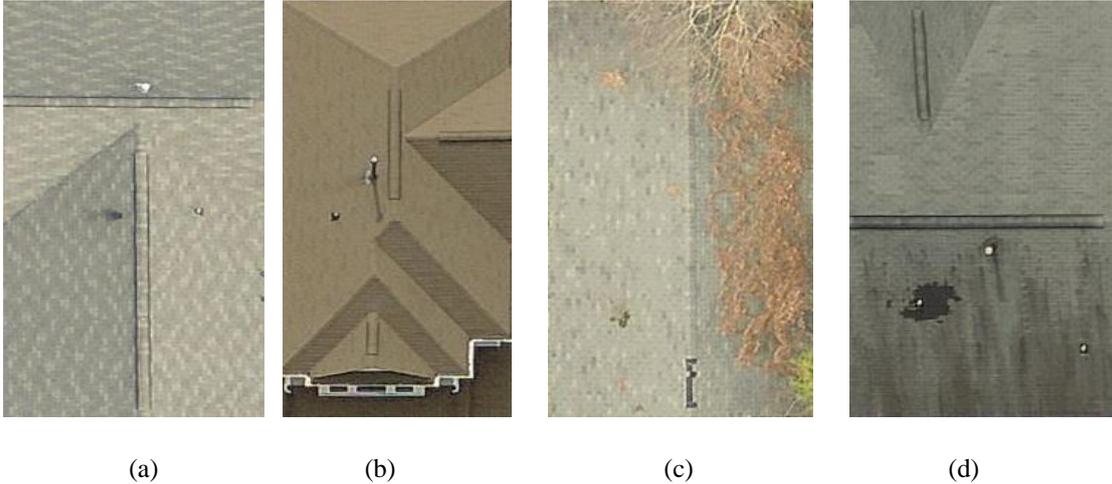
Pictometry rooftop sample images. (a) Intact roof. (b) “Structured” roof. (c) Roof with tree and dust. (d) Roof with cosmetic damage and missing shingle.
